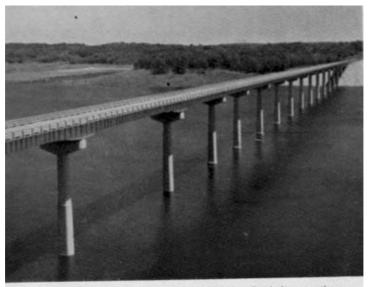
Stockton, Missouri. A large relocation bridge of typical construction.
